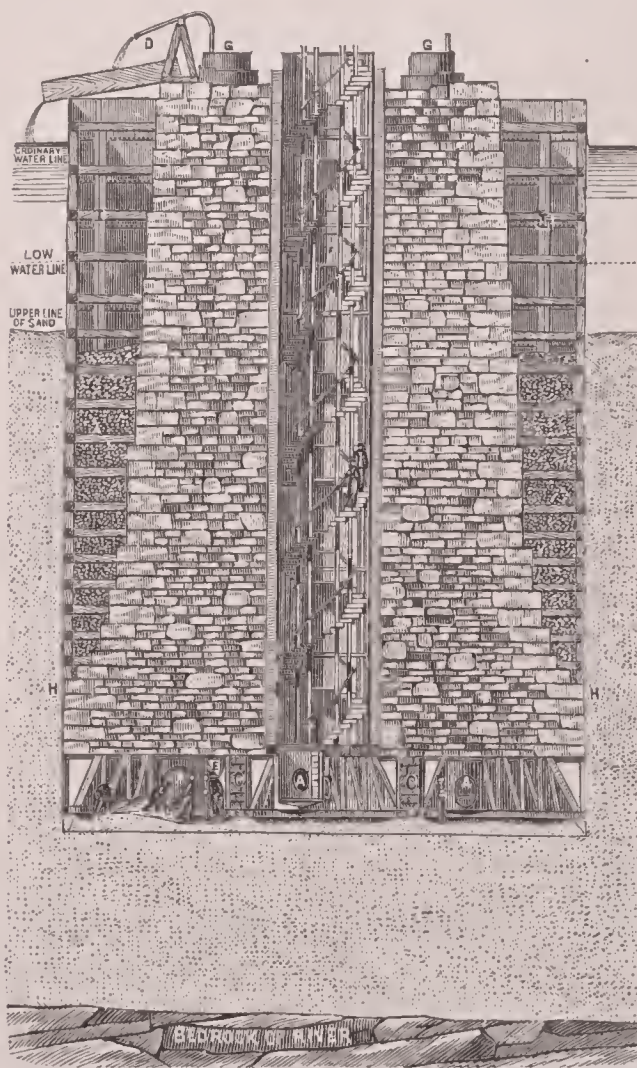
Section of east pier and caisson, showing the interior of the main entrance-shaft and air-chamber, and the working of one of the sand-pumps, Illinois and St. Louis bridge: A, air-locks; B, air-chamber; C, timber girder; D, discharge of sand-pump; E, sand-pumps; F, main entrance-shaft; G, side shaft; H, iron envelope; I, bracing for shell.
